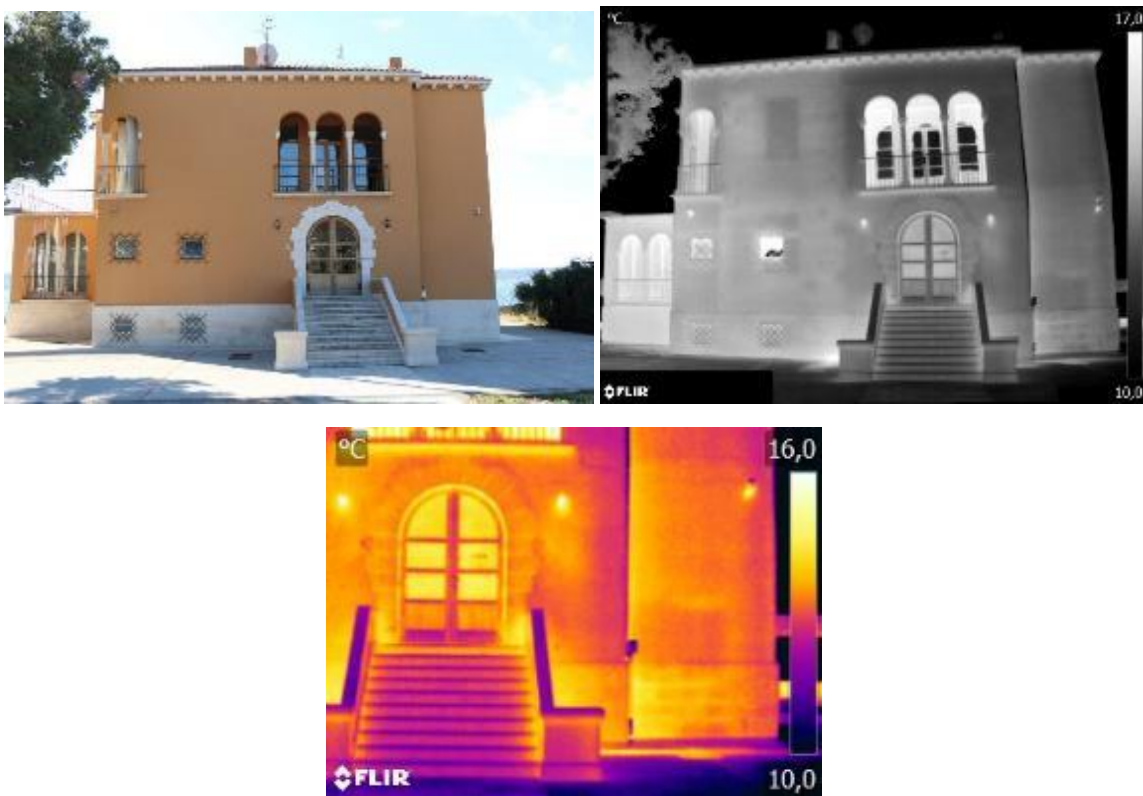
Former Ballet school: The building was reconstructed several times; horizontal lines are characteristics of the unreinforced concrete poured into wooden framework.
